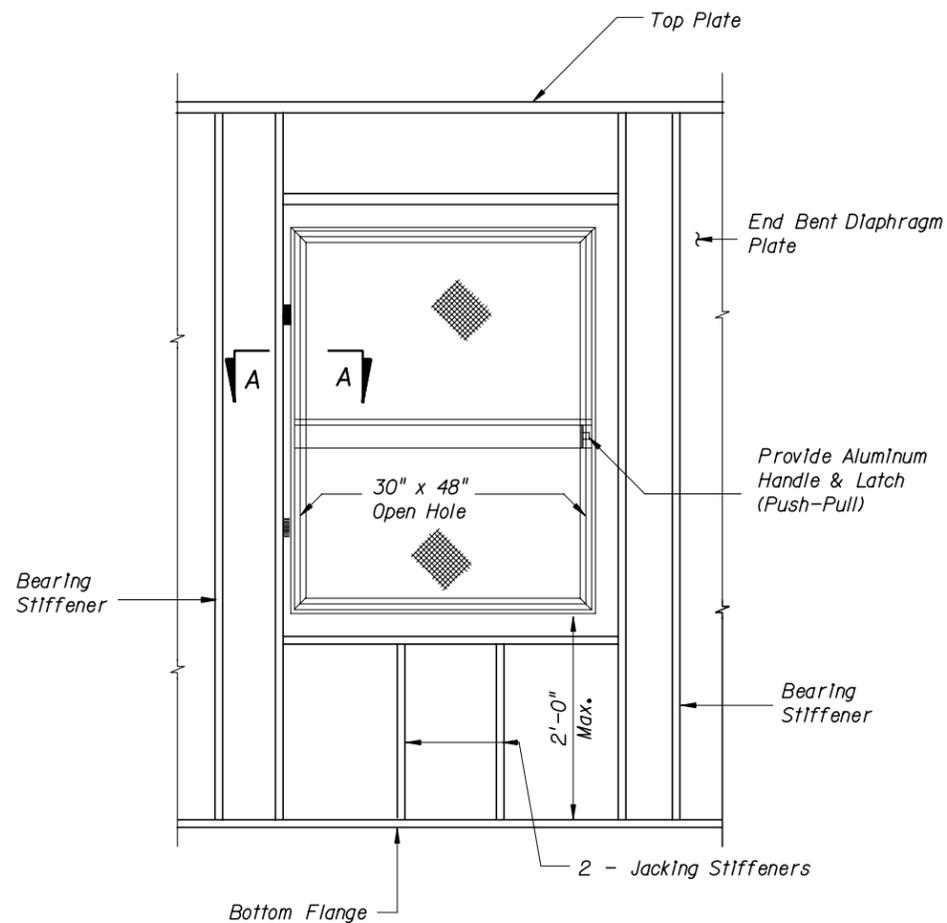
DETAIL NAME:	TYPICAL CROSSFRAME DETAILS BOX GIRDER BRIDGES	SHEET NO.	S-11
